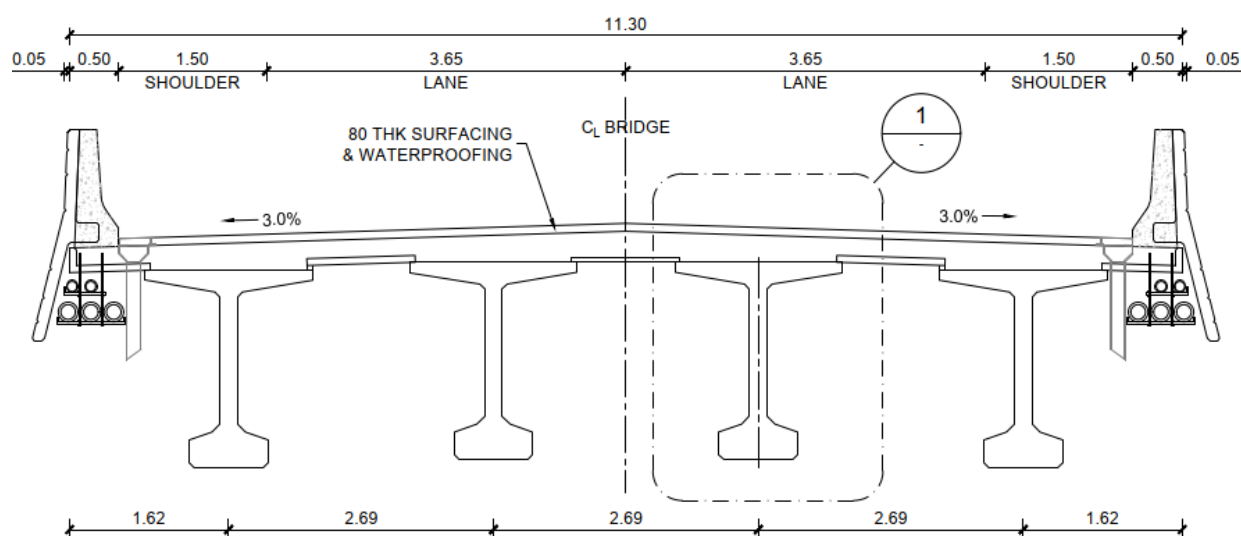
Typical cross section (Precast I-Girders) for Netrokona-Sunamganj elevated road
